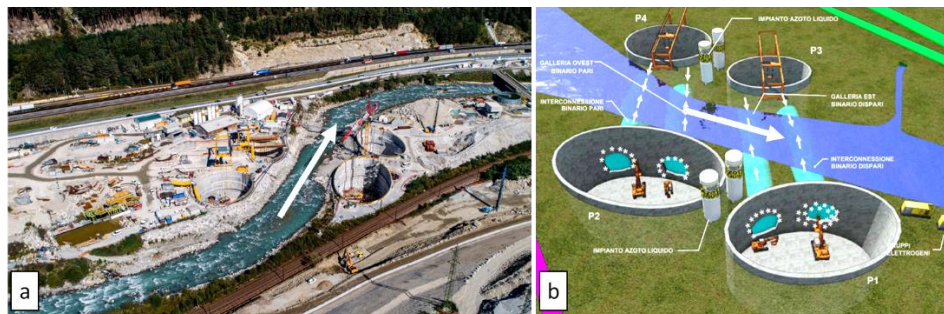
Isarco River underpass construction site: a) aerial photo of the excavation stages of four shafts; b) layout of AGF intervention in support of four tunnels under the river, starting from shafts.
